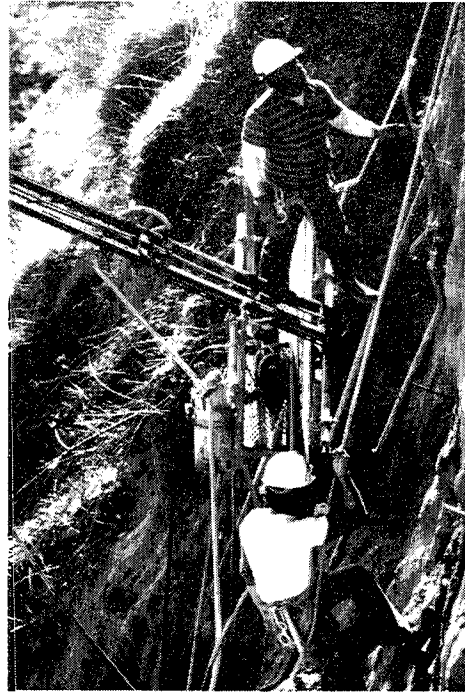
B WATER JET DRILL TRACK SUSPENDED FROM CLIFF FACE
